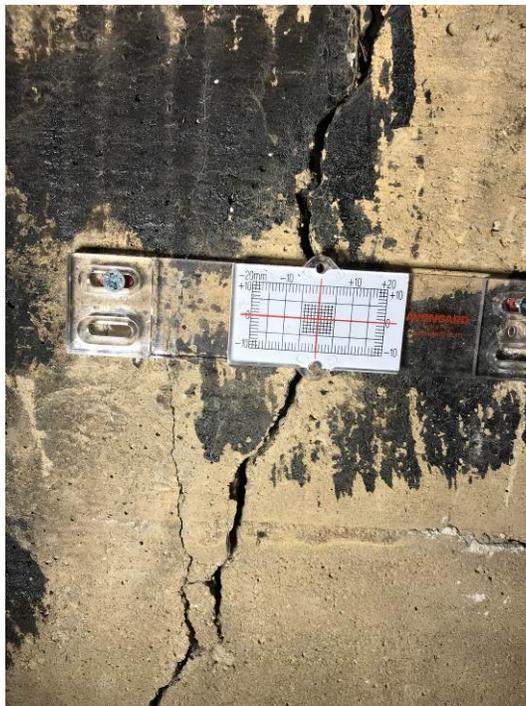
Building crack monitor and interior west wall on May 24, 2018.
